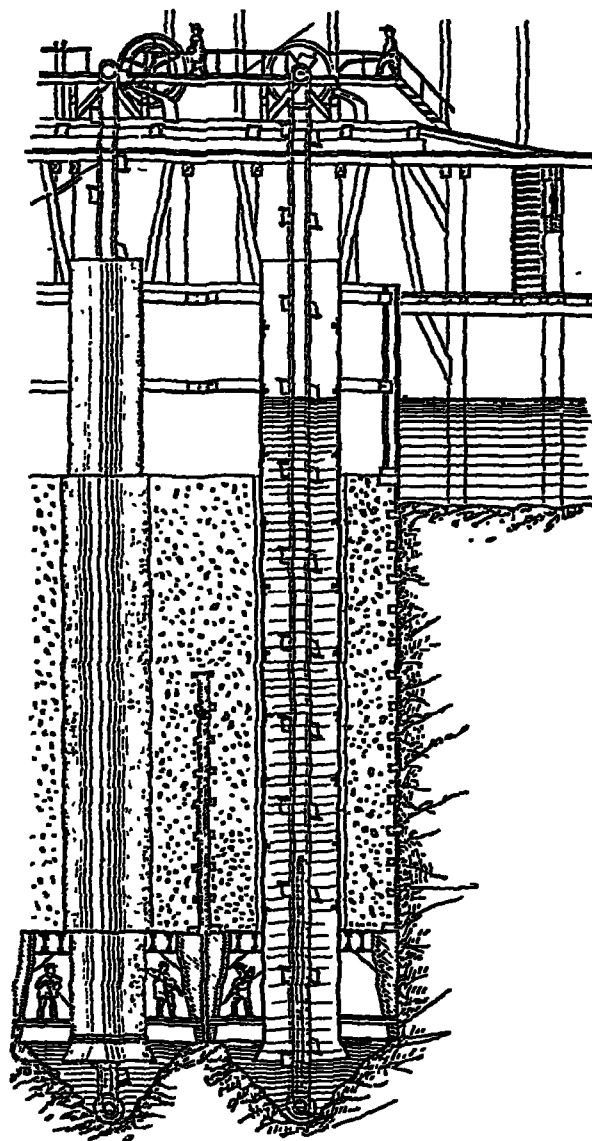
Foundations, Bridge of Kehl on the Rhine.
